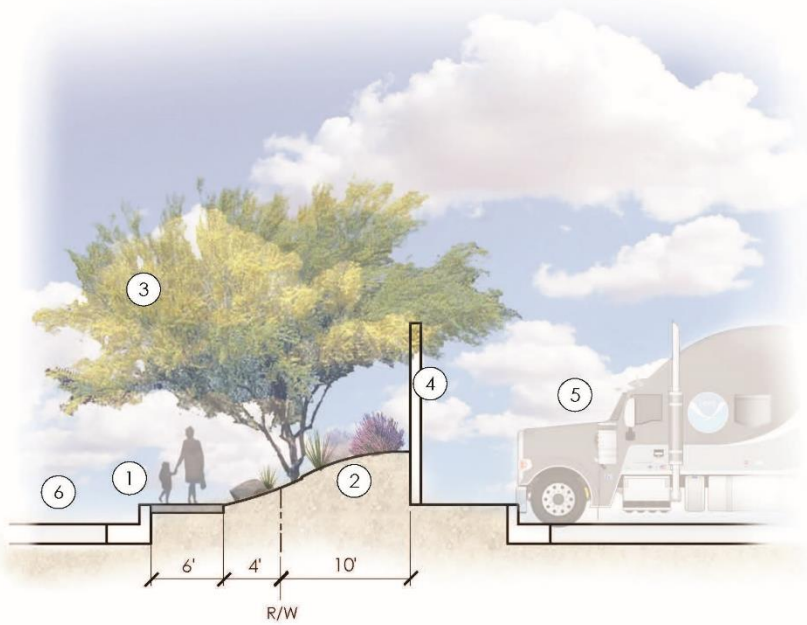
Monroe Street Parkway – Commercial Edge Condition (West)
